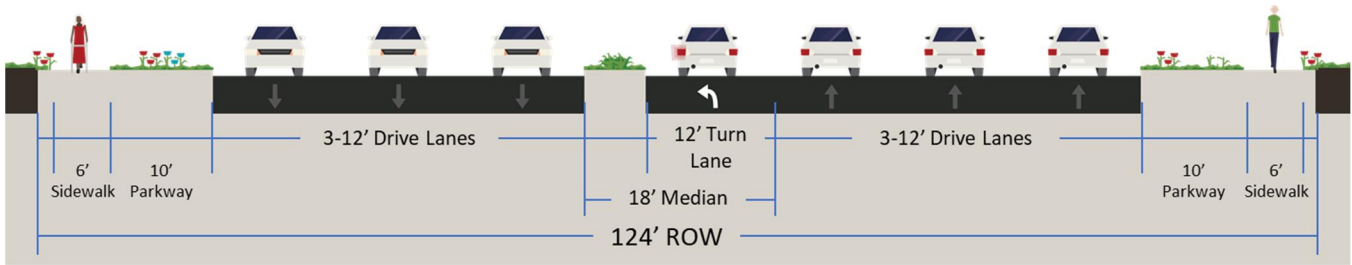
Proposed Cross Section: 6-Lane Divided Arterial
